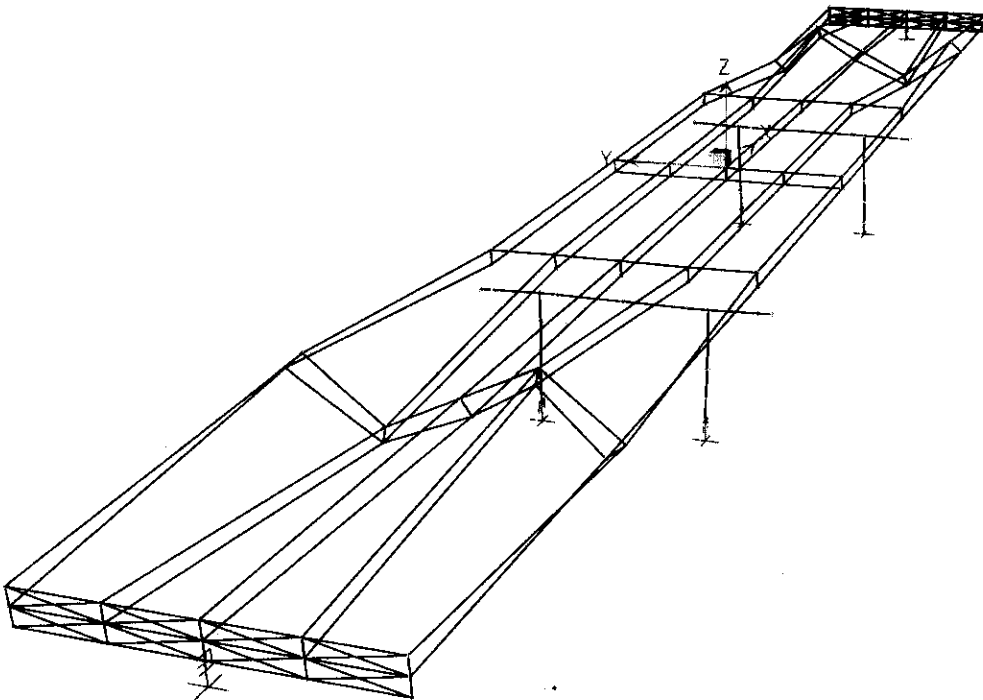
Mode 1, Period 0.2686 Seconds (New Wahite Ditch Bridge)
